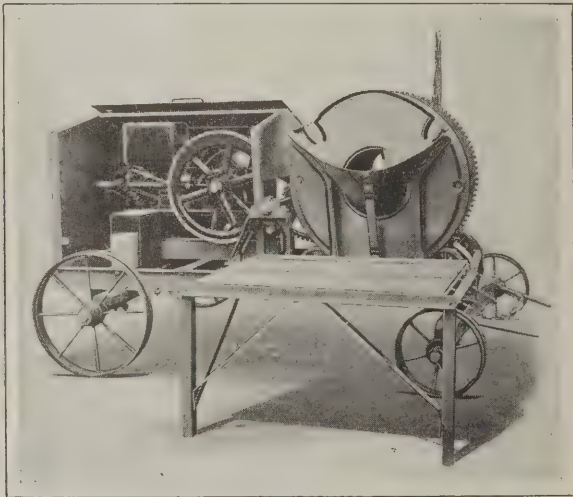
The Knickerbocker Mixer with Engine Housing Removed to Show the Operating Mechanism
